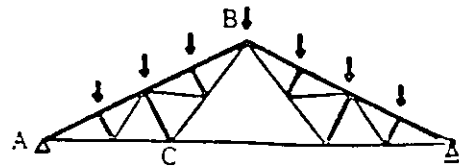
Stress on truss subjected to loads other than vertical ones
